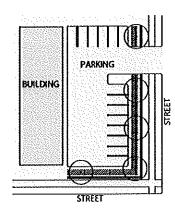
Landscaping Buffer with Evergreen Plantings-Plan View
